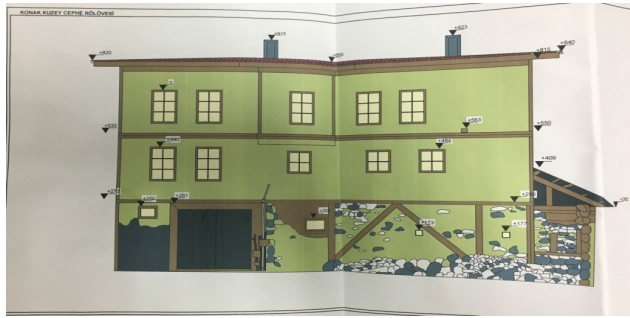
Restoration face of house in windows of traditional buildings by CanselCakir.
